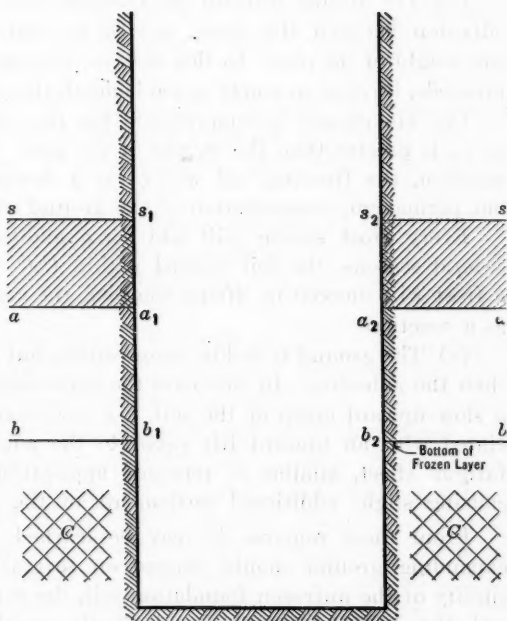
EFFECT OF SOIL FREEZING ON A FOUNDATION PIER.
